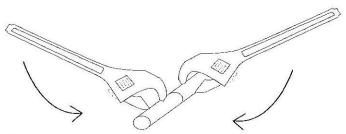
Using wrenches in opposite directions on fittings with opposing torque
